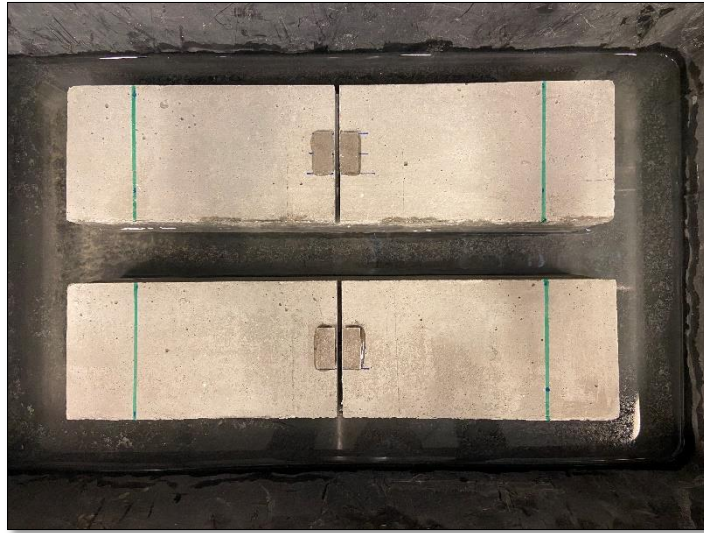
Oyster shell concrete specimens notched (20 mm) and placed on the water until the test.
